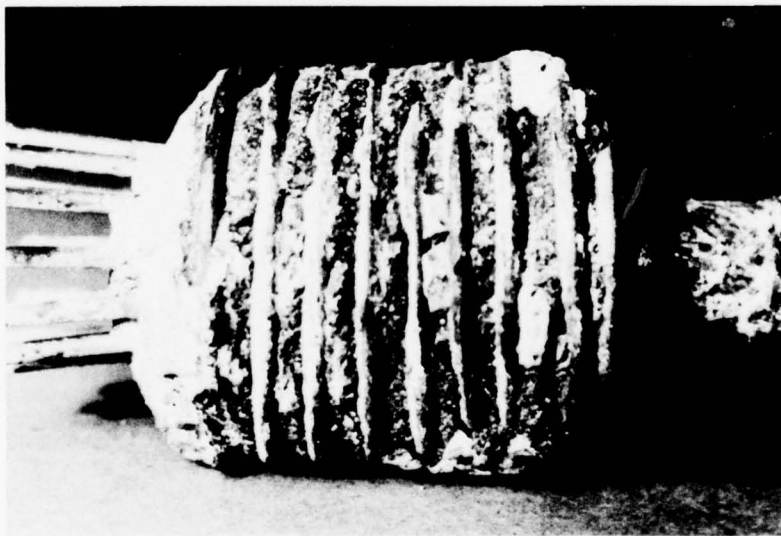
Landward end anchorage of beam 6. Note cement bonded to steel coils and tarnishing on coils but no rusting
